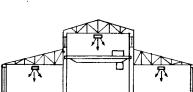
Typical installation of vertical air discharge unit heaters in a heavy industry factory building. NOTE: Large unit near door.
